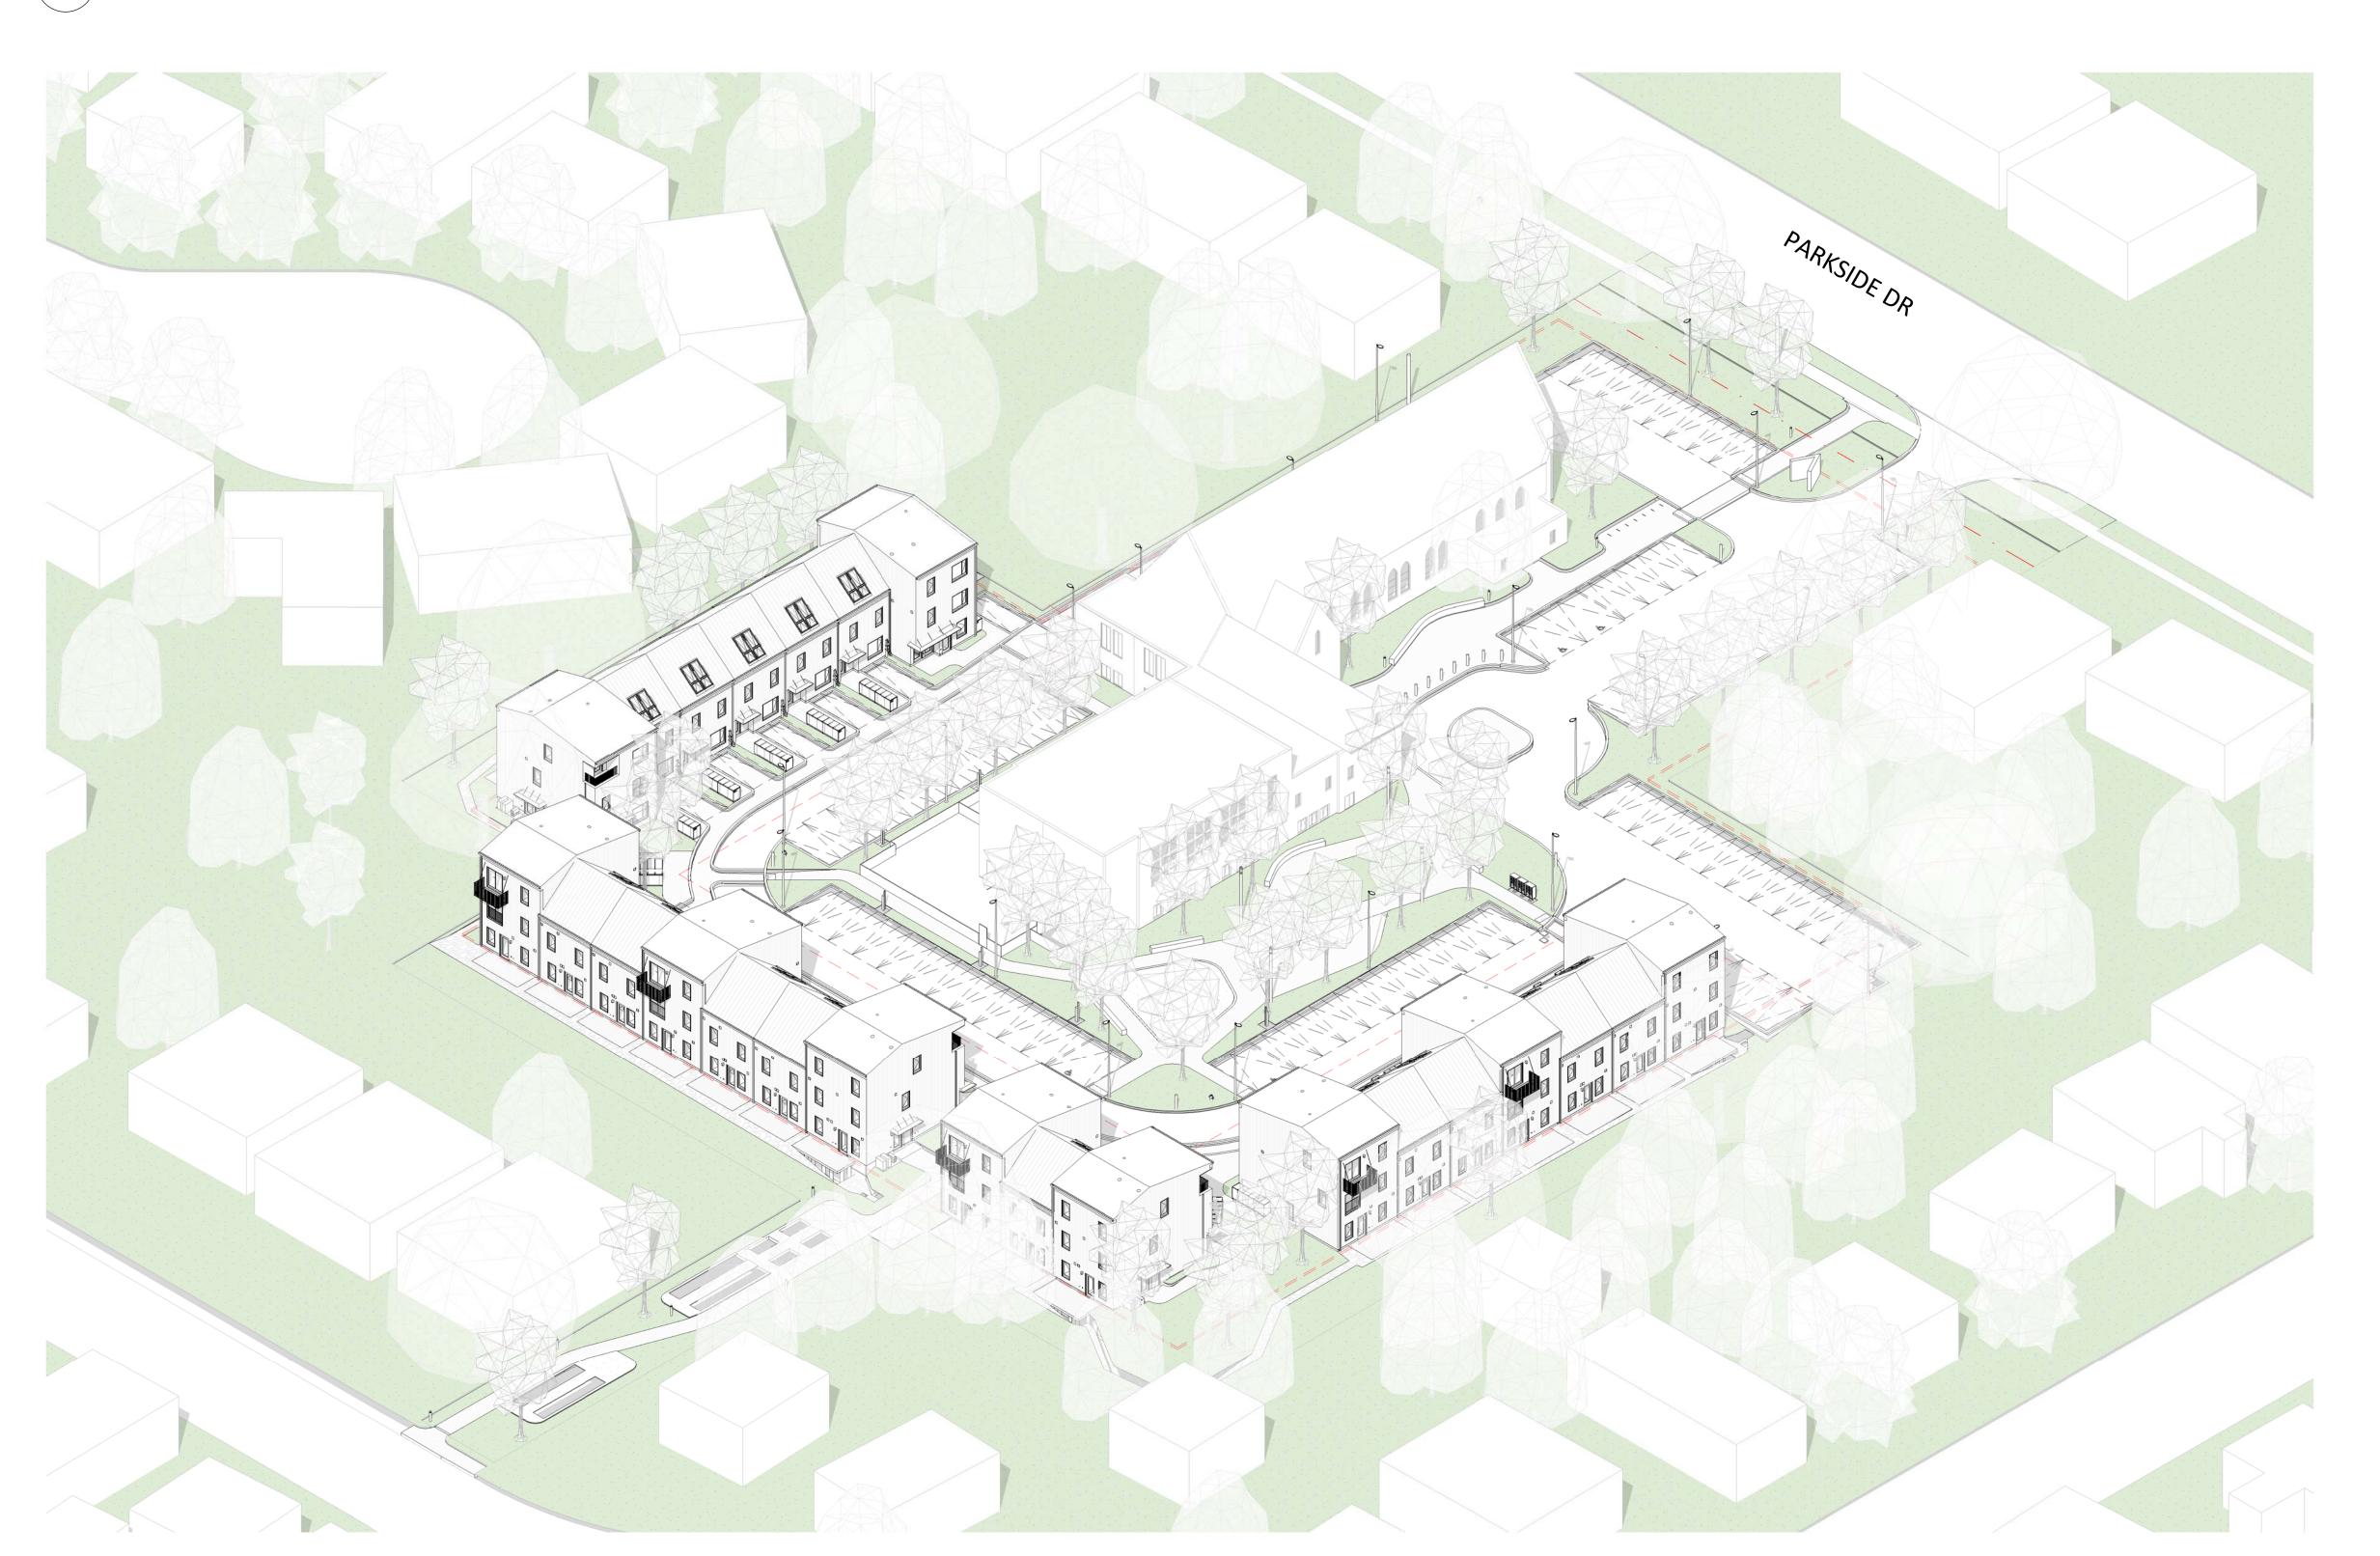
GROUP 1 & 2 TOWNHOMES AND WALKUPS
